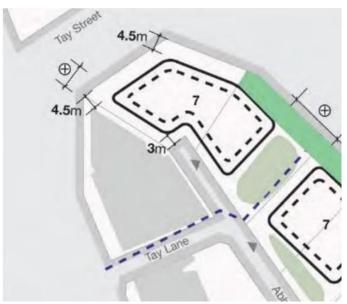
Kensington North DCP Block Plan (Source: RCC)
